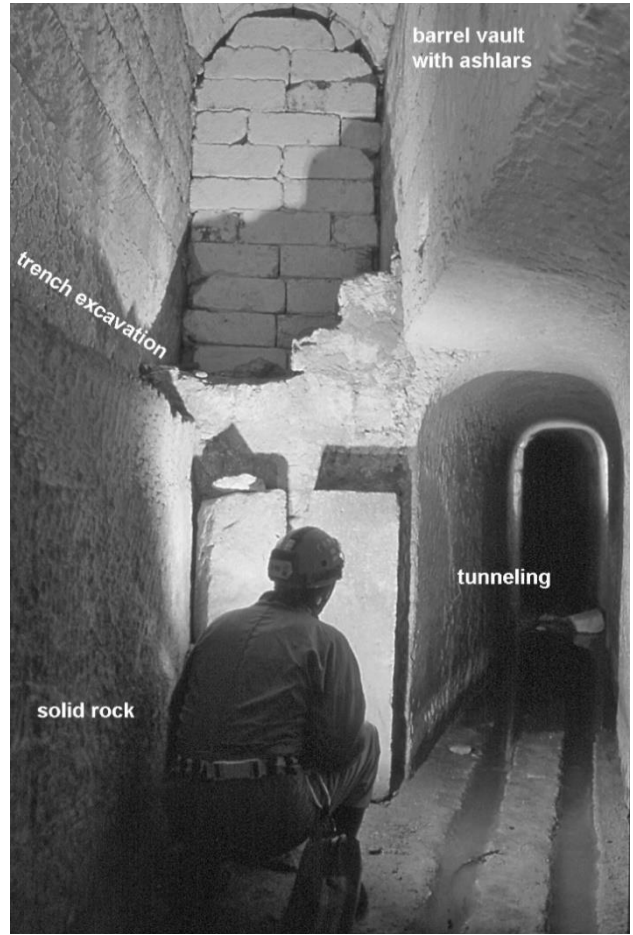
Underground aqueduct of Gravina in Puglia (southern Italy). Mixed excavation technique in solid rock: tunnel and trench, with partial coating and cover in stone ashlars (photo M. Traverso)
